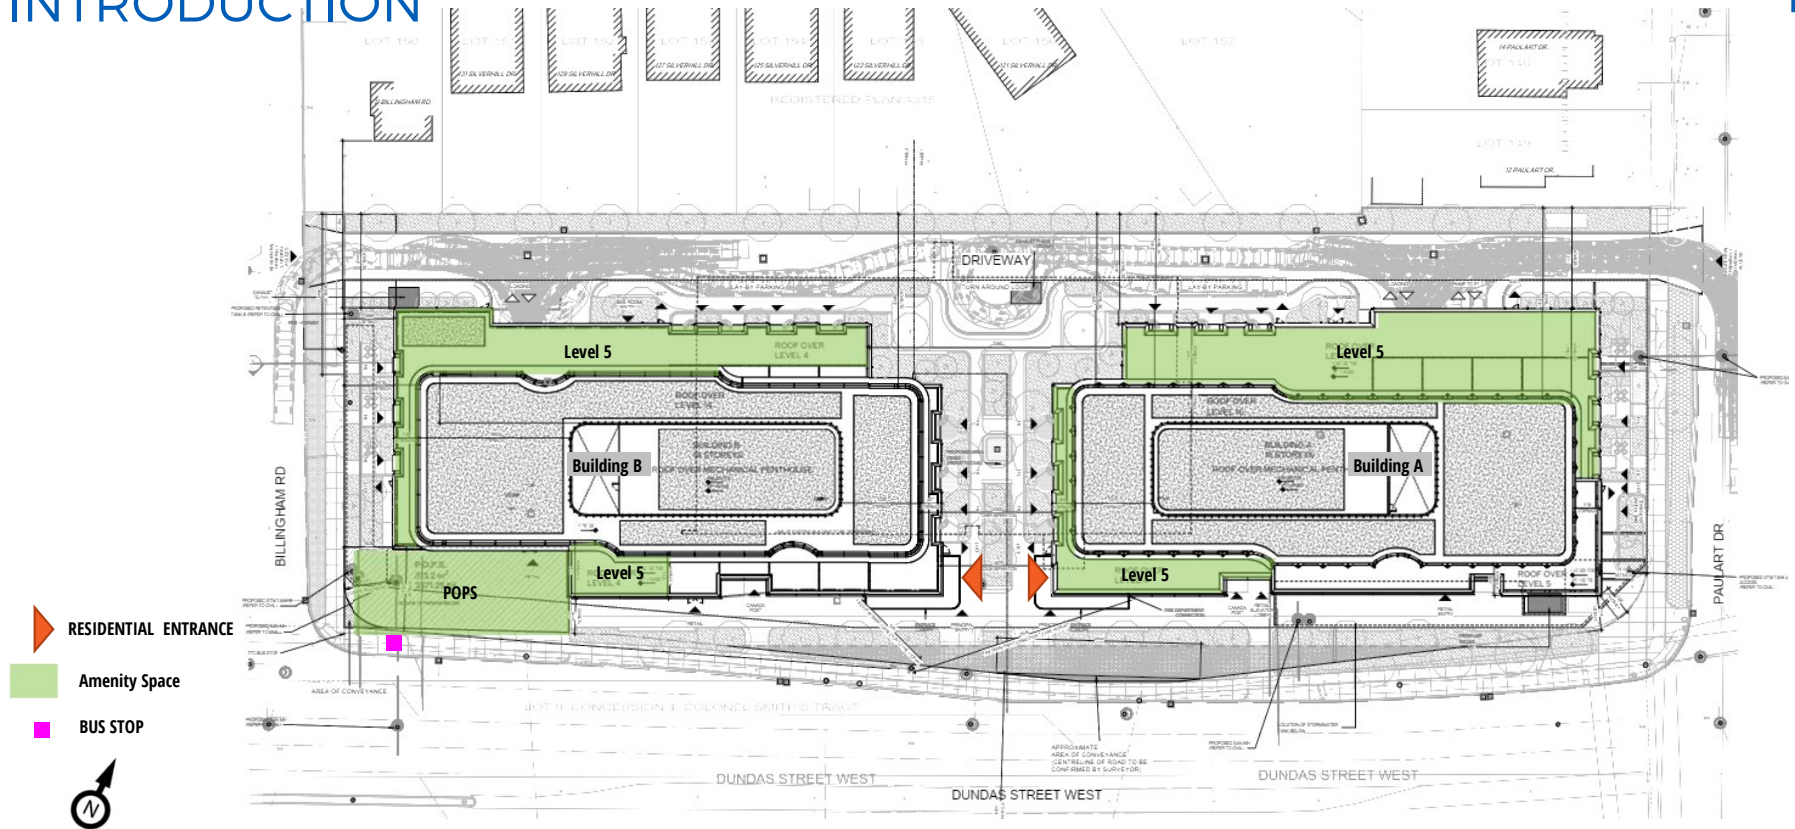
Site Plan identifying Key Outdoor Areas of Interest
